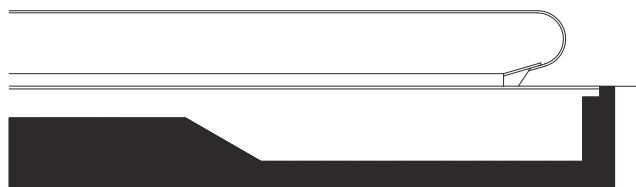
Longitudinal section of typical moving walkway showing below floor service space.
